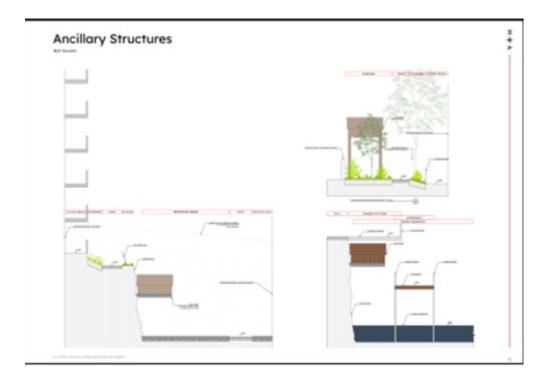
Extract from LCLE001 Landscape Plan showing proposed bat houses
